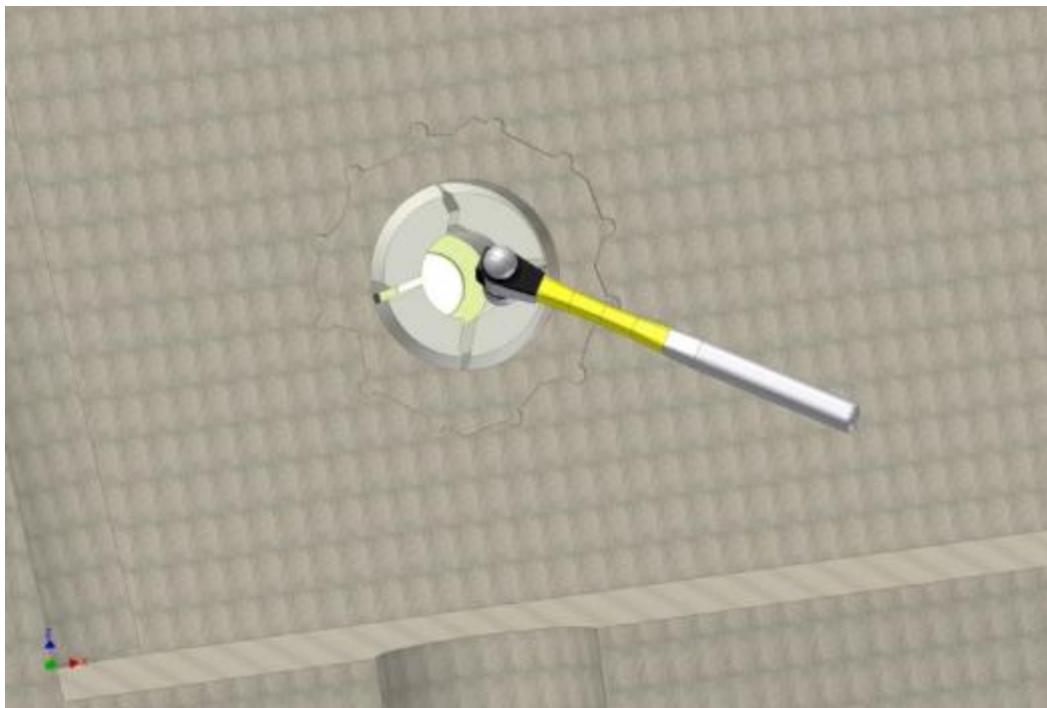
Depending on the damage, the [CasTemp block](#) may be removed with hand tools.
